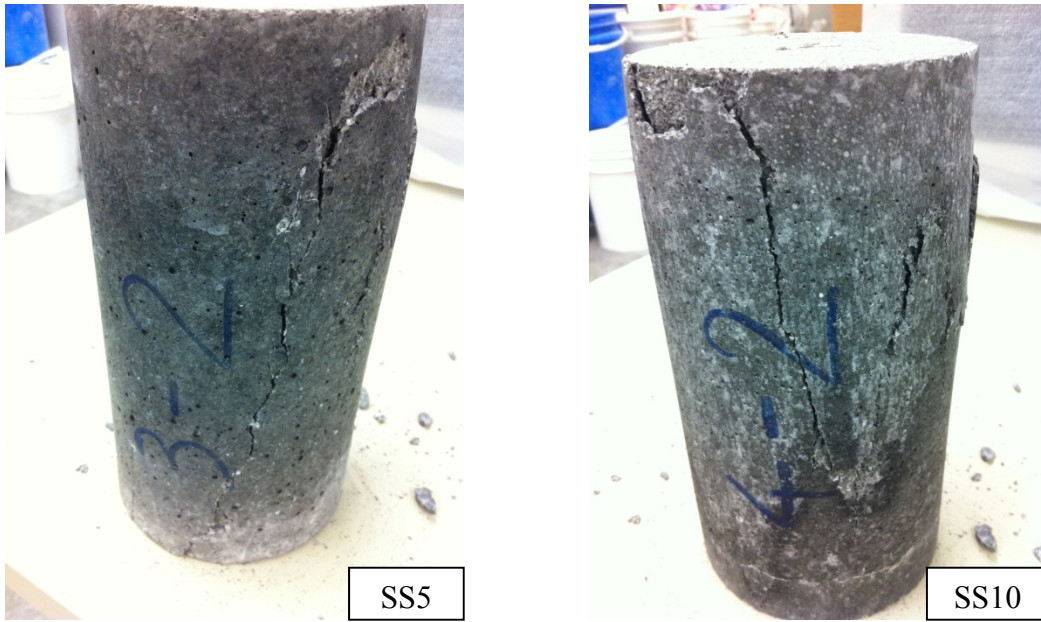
Typical failure of cylinder specimens of mixes SS5 and SS10
